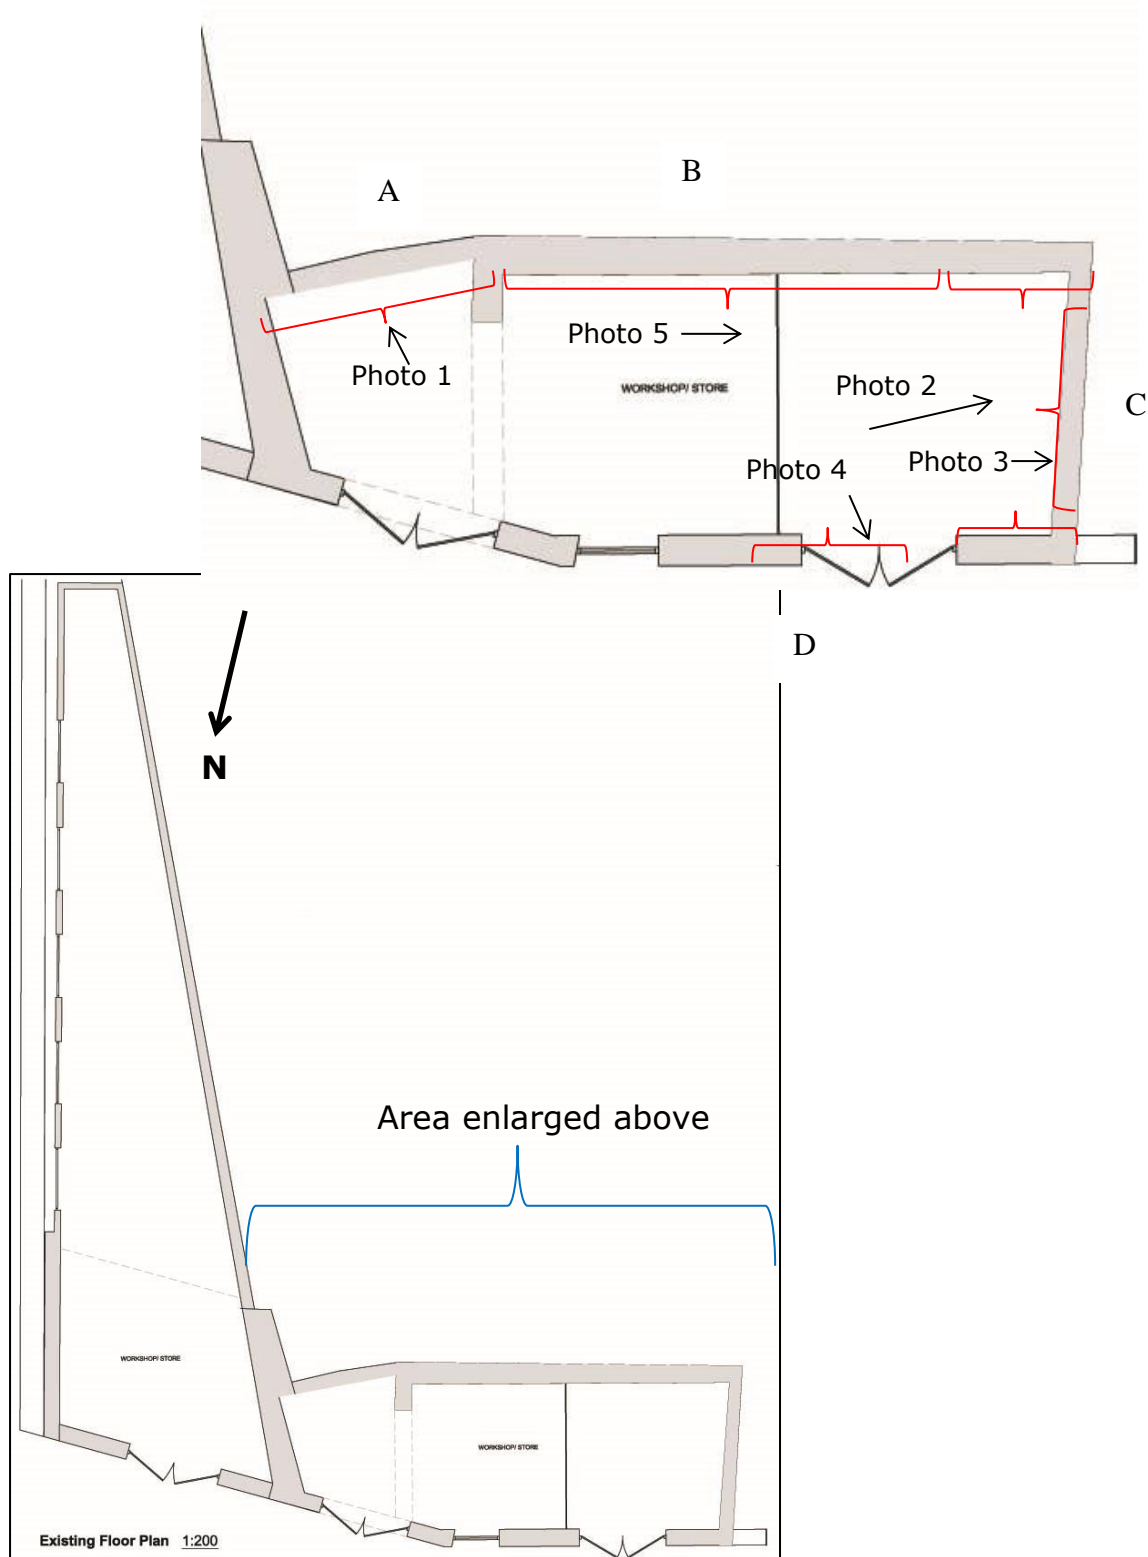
Plan of site showing positions of photos. Extract of plan supplied by client
